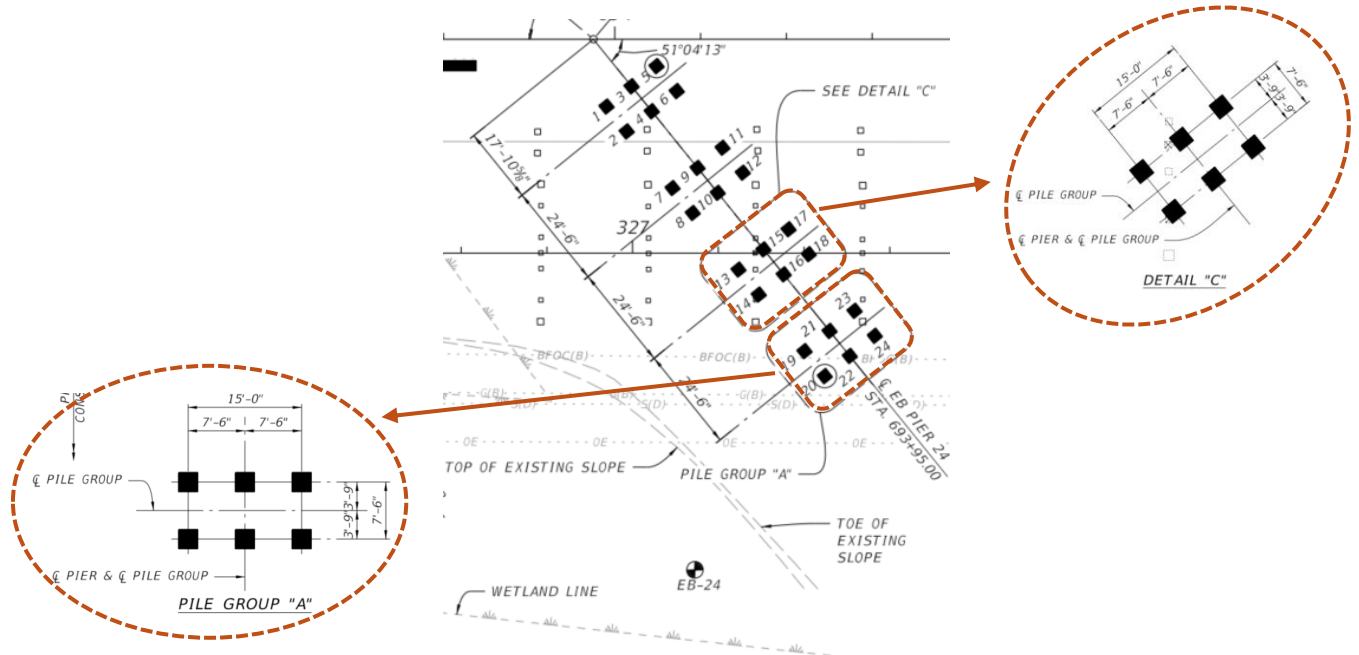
Pile group details – Selected Pier no.24 of the Eastbound Bridge (B1-83, B1-84)
